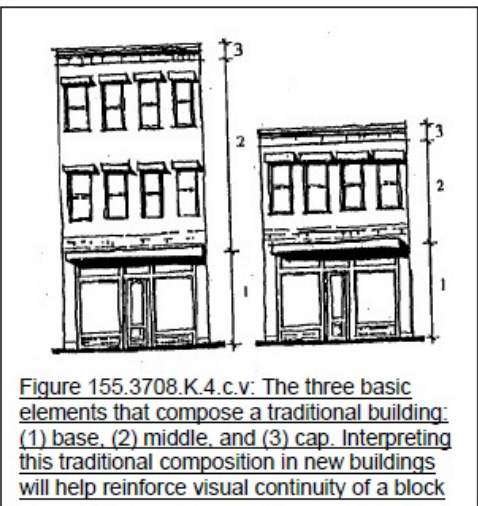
K.4.c.v: The three basic elements that compose a traditional building: (1) base, (2) middle, and (3) cap. Interpreting this traditional composition in new buildings will help reinforce visual continuity of a block
